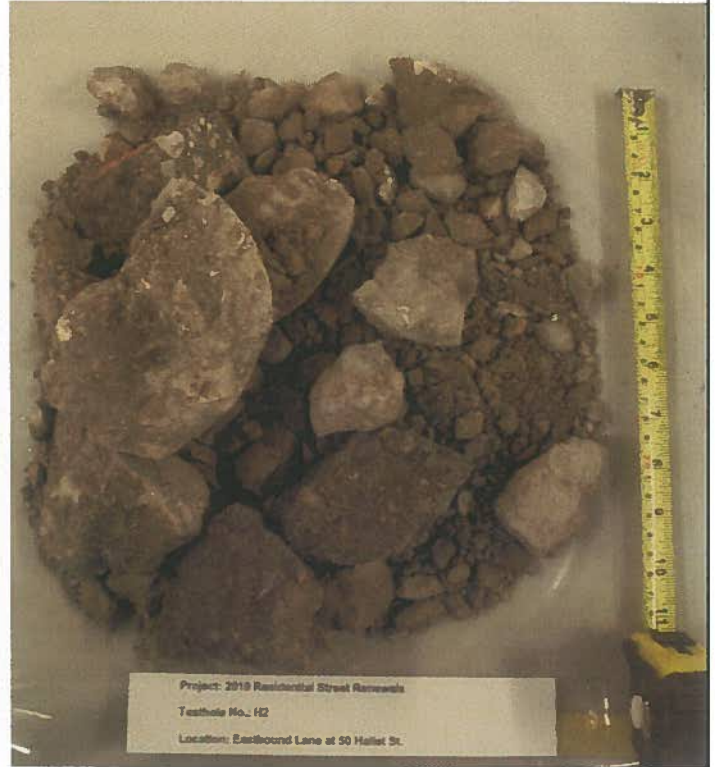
Test Hole H2: 50 Hallet St. Eastbound Lane, 15m E of W sidewalk at George Ave., 1.9m N of S curb
